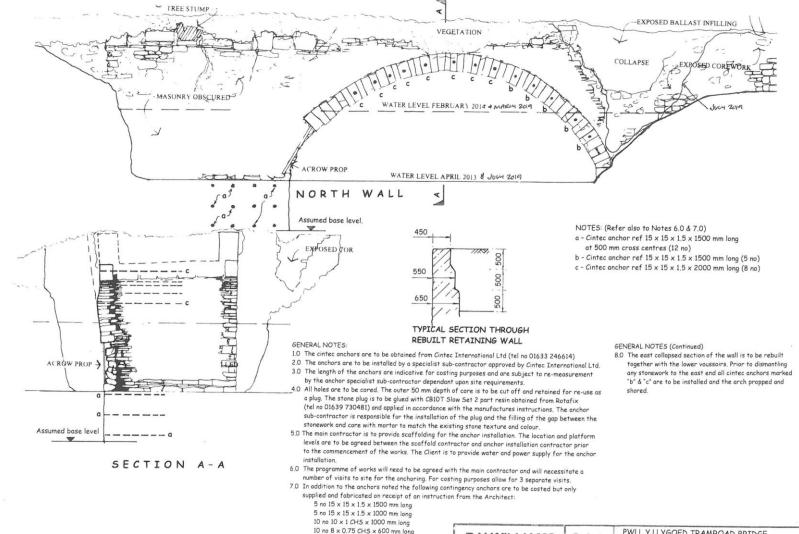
North Wall Structural Details – R V Williams Associates.
